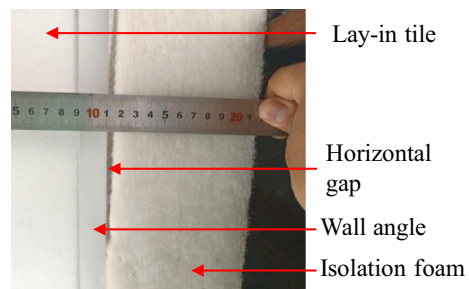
Horizontal gap between the wall angle and the isolation foam.
